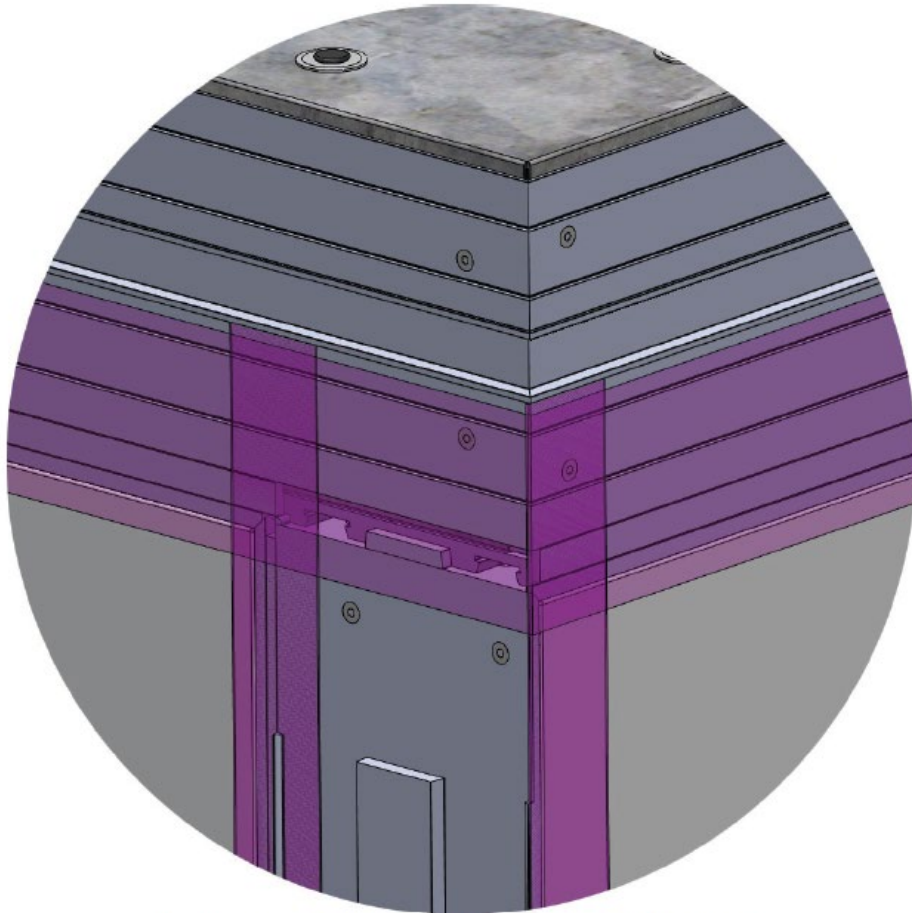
WALLS TO ROOF HORIZONTAL SEAM
